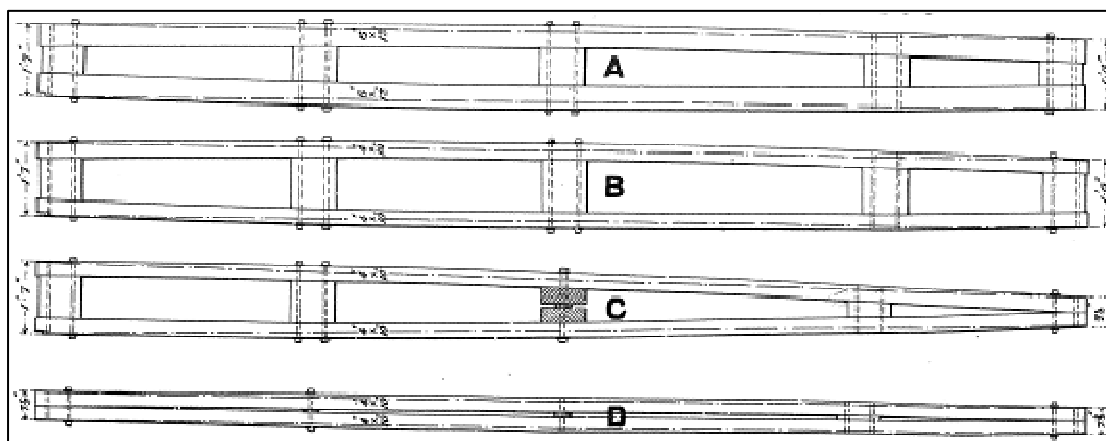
Typical Layouts of Spaced Columns – excerpt from Morpeth Bridge Plans
